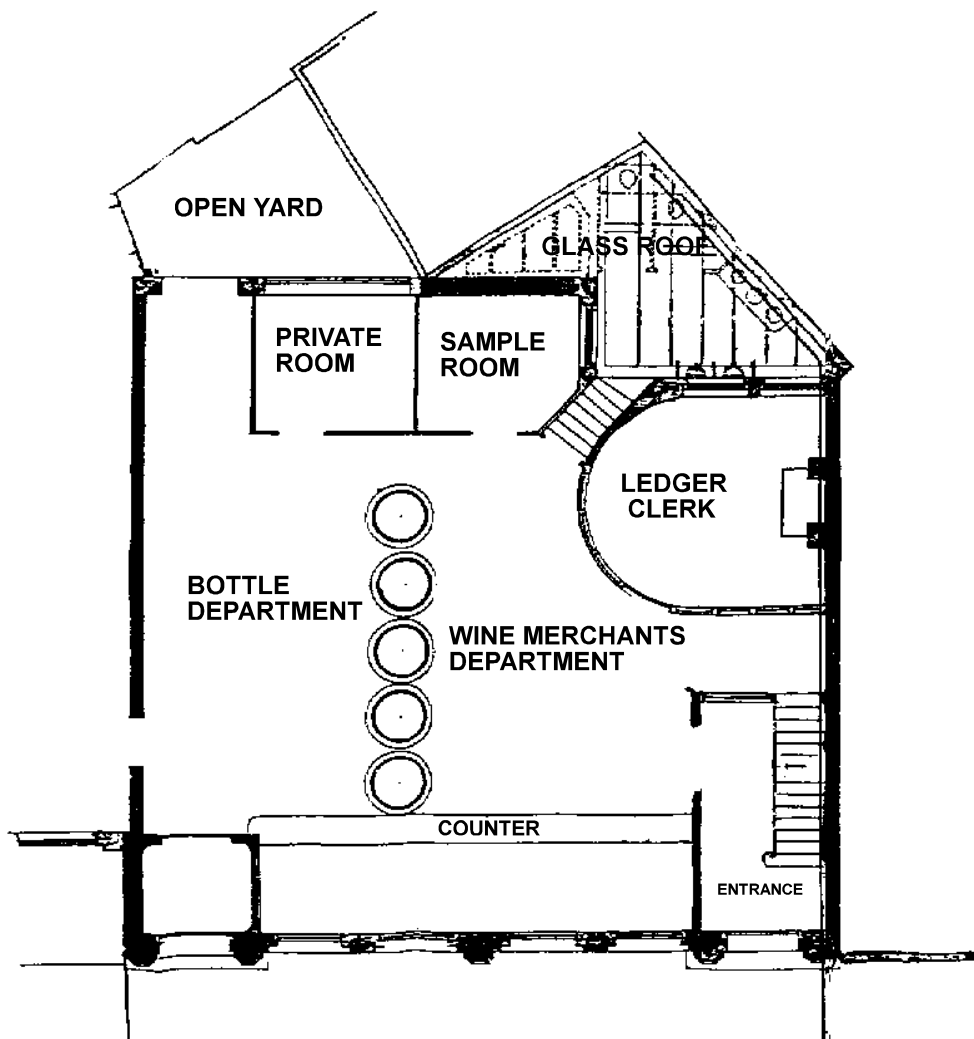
Savile House, 1877, Ground Plan (redrawn from OB 4597)
